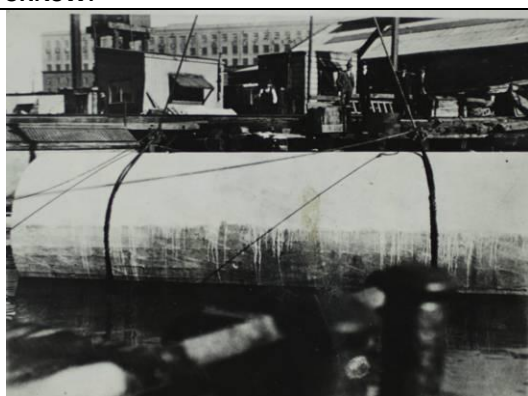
Reinforced concrete Monier pipe being lowered into position. State Rail Photo Series: 17420 Item: 364/48B SRNSW.
